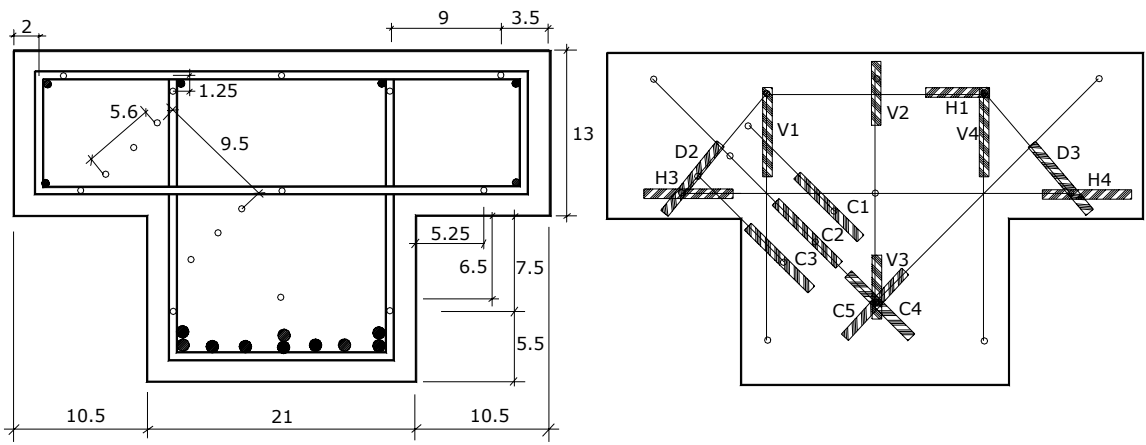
LVDT and Strain Gauge Arrangement for Specimen E-0-6	51
